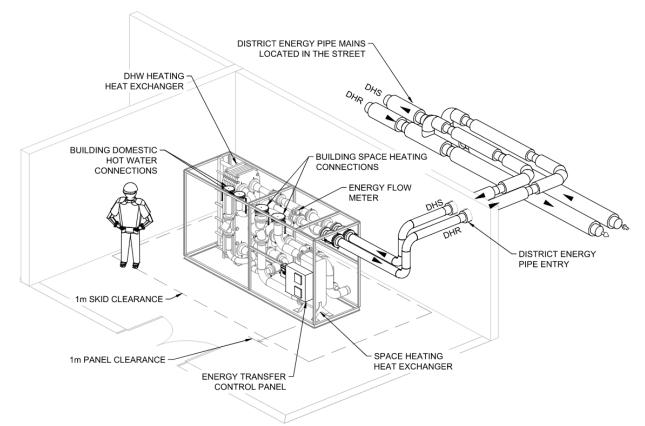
TYPICAL HEATING ETS INSTALLATION IN BUILDING
